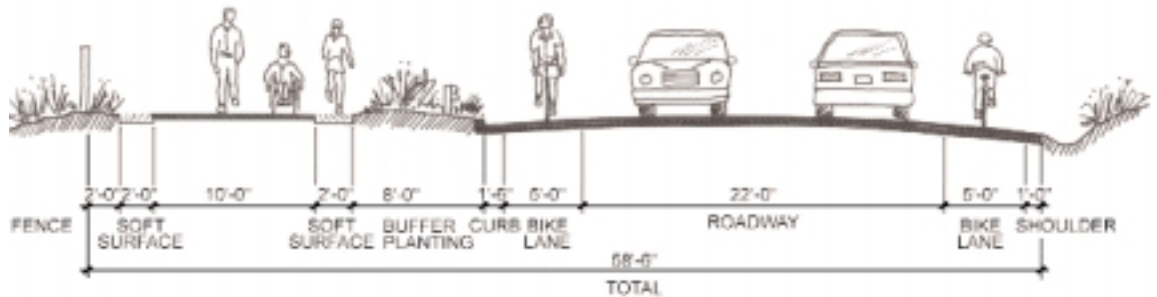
Proposed Development at Lincoln Boulevard at Kobbe Avenue
